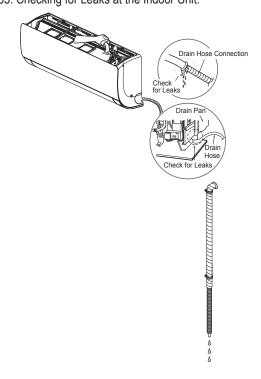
Wall-Mounted Indoor Unit (SV Frame) Drain Leak Test
